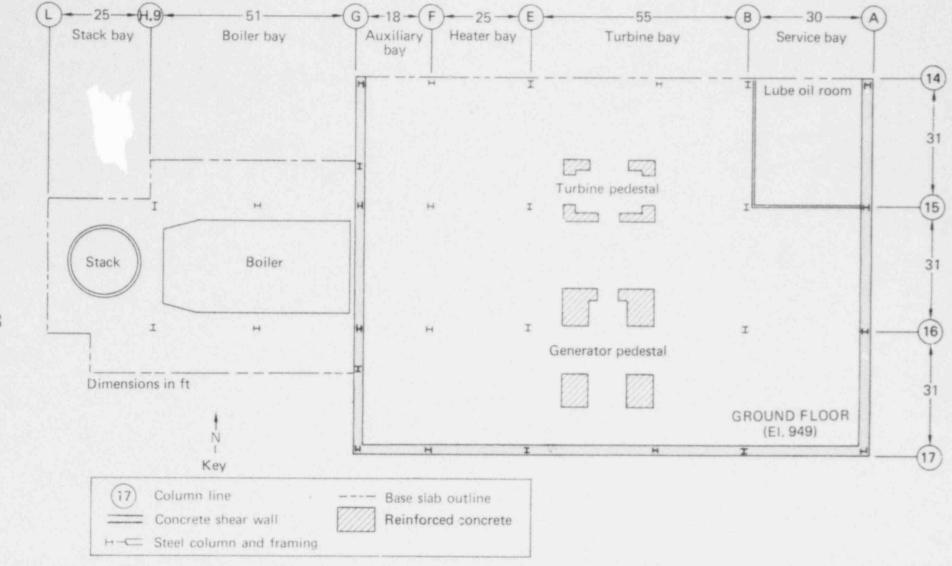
Schematic plan view of the Unit 4 ground floor (El. 949 ft) shows shear walls, column lines, foundation outline, and turbine-generator supports.
